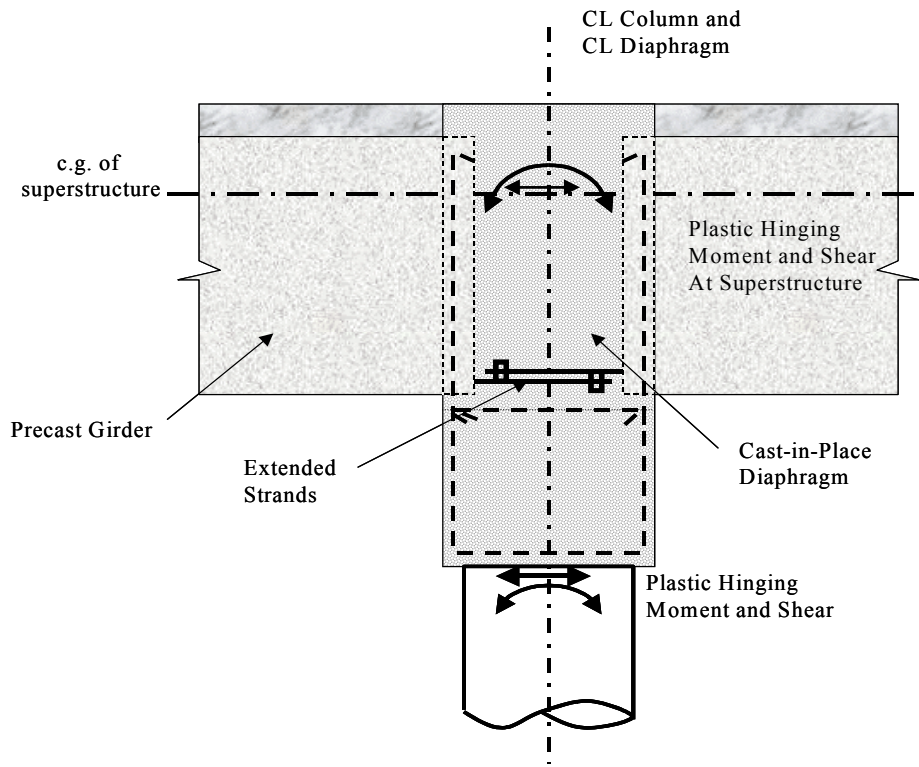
Superstructure to Substructure Connection at Intermediate Pier
